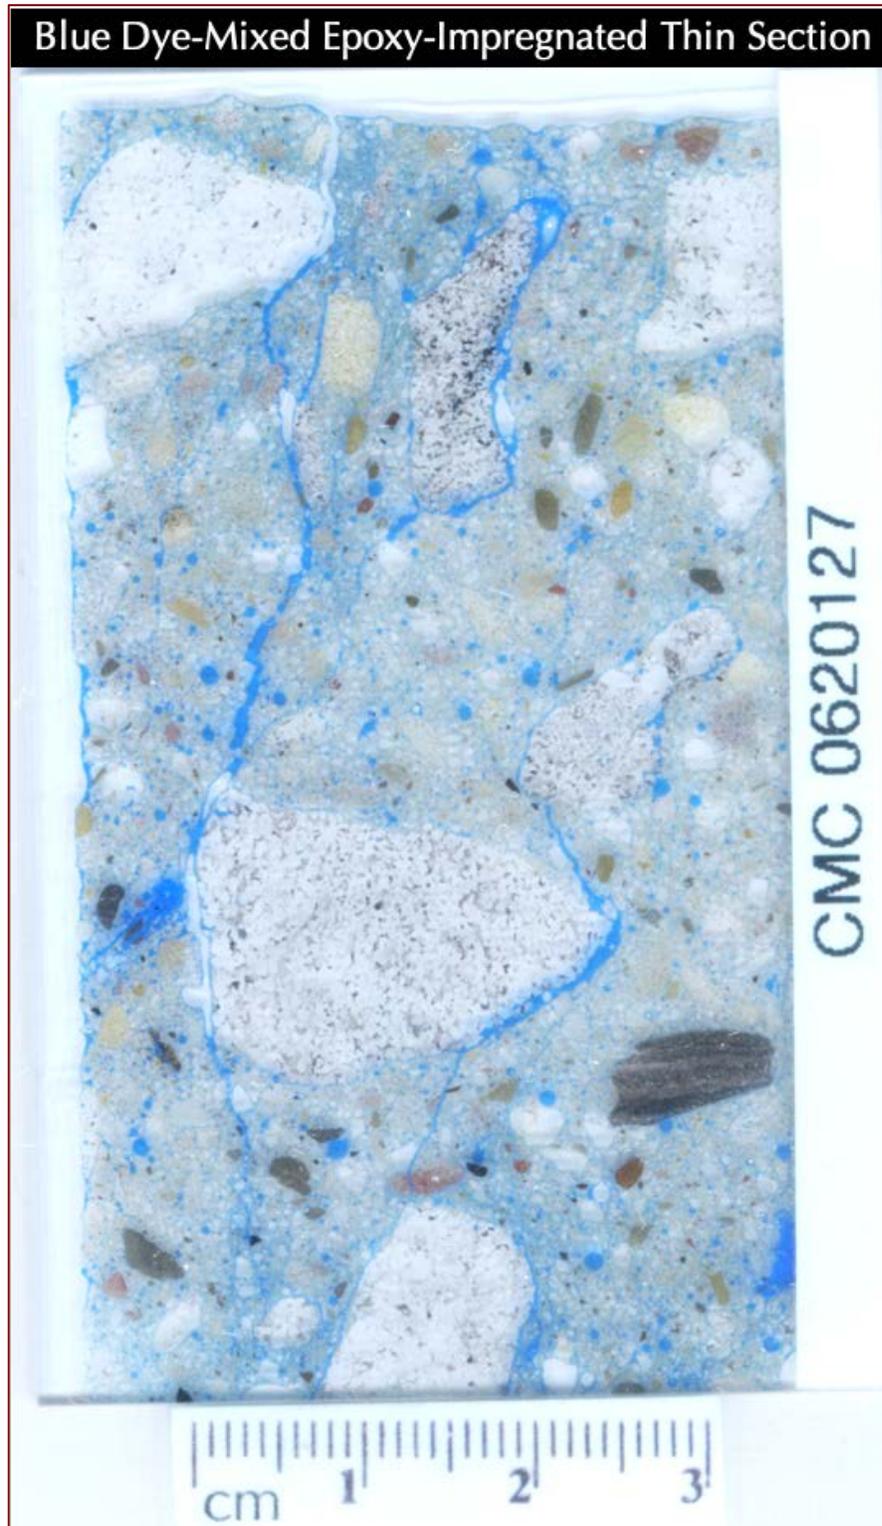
Blue dye-mixed epoxy-impregnated thin section of concrete showing cracks from previous strength test and air voids that are highlighted by the blue epoxy.
